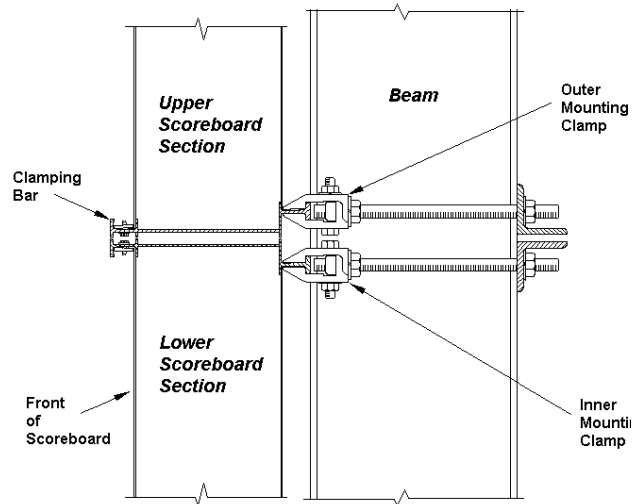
Multi-Section Scoreboard Mounting (Side View)
